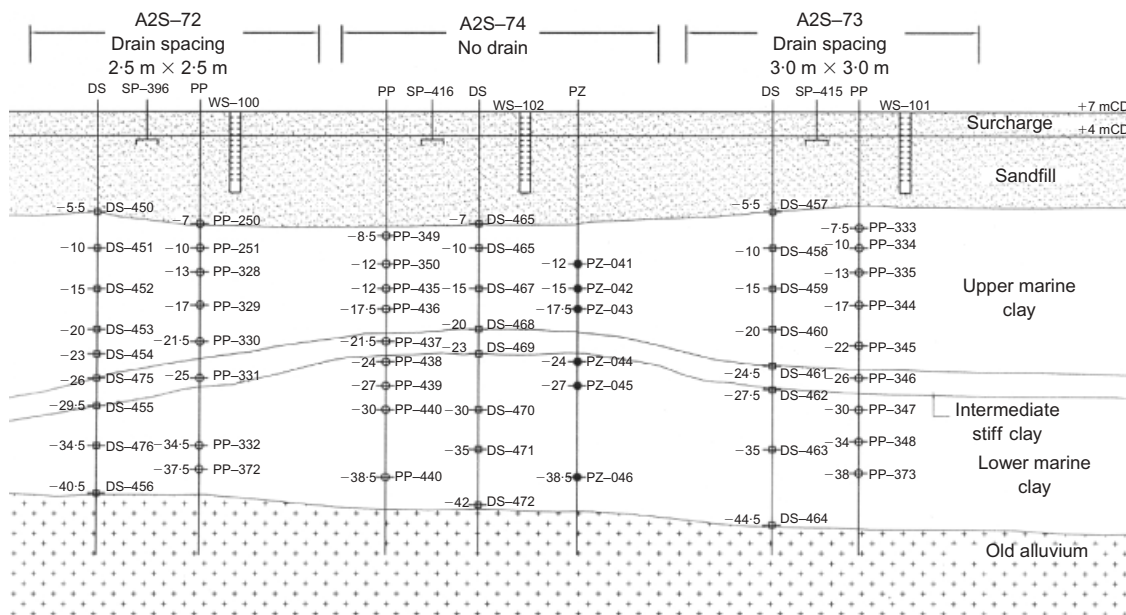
Cross-sectional soil profile showing instrument elevations at pilot test site. SP, settlement plate; DS, deep settlement gauge; PP, pneumatic piezometer; WS, water standpipe
